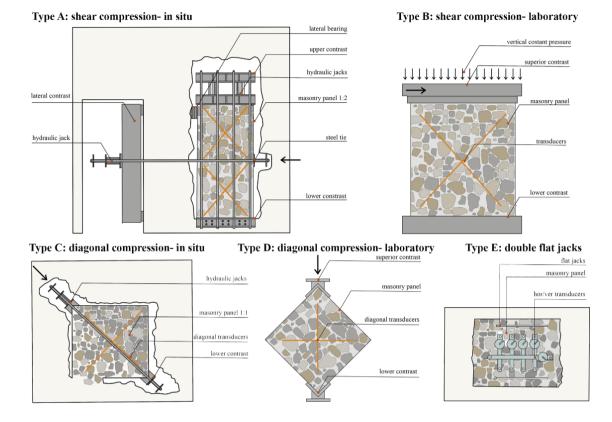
Test types: (a) shear compression-in situ; (b) shear compression-laboratory; (c) diagonal compression in situ; (d) diagonal compression laboratory; (e) double flat jacks.
